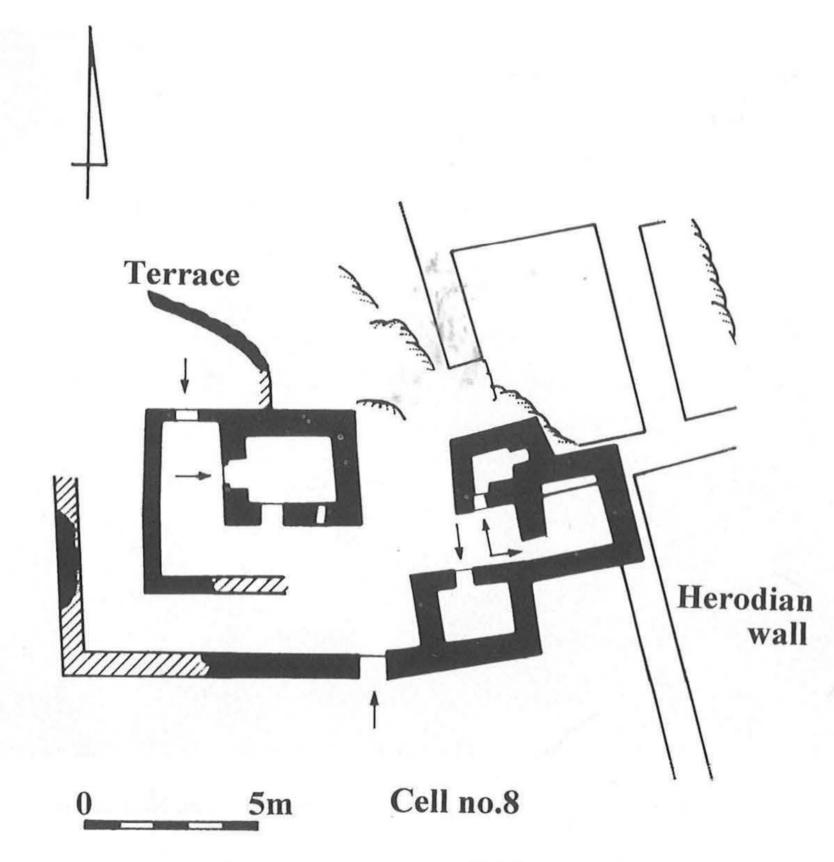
Plan of Cell 8 abutting the eastern casemate wall (after Masada III, Plan 55).
